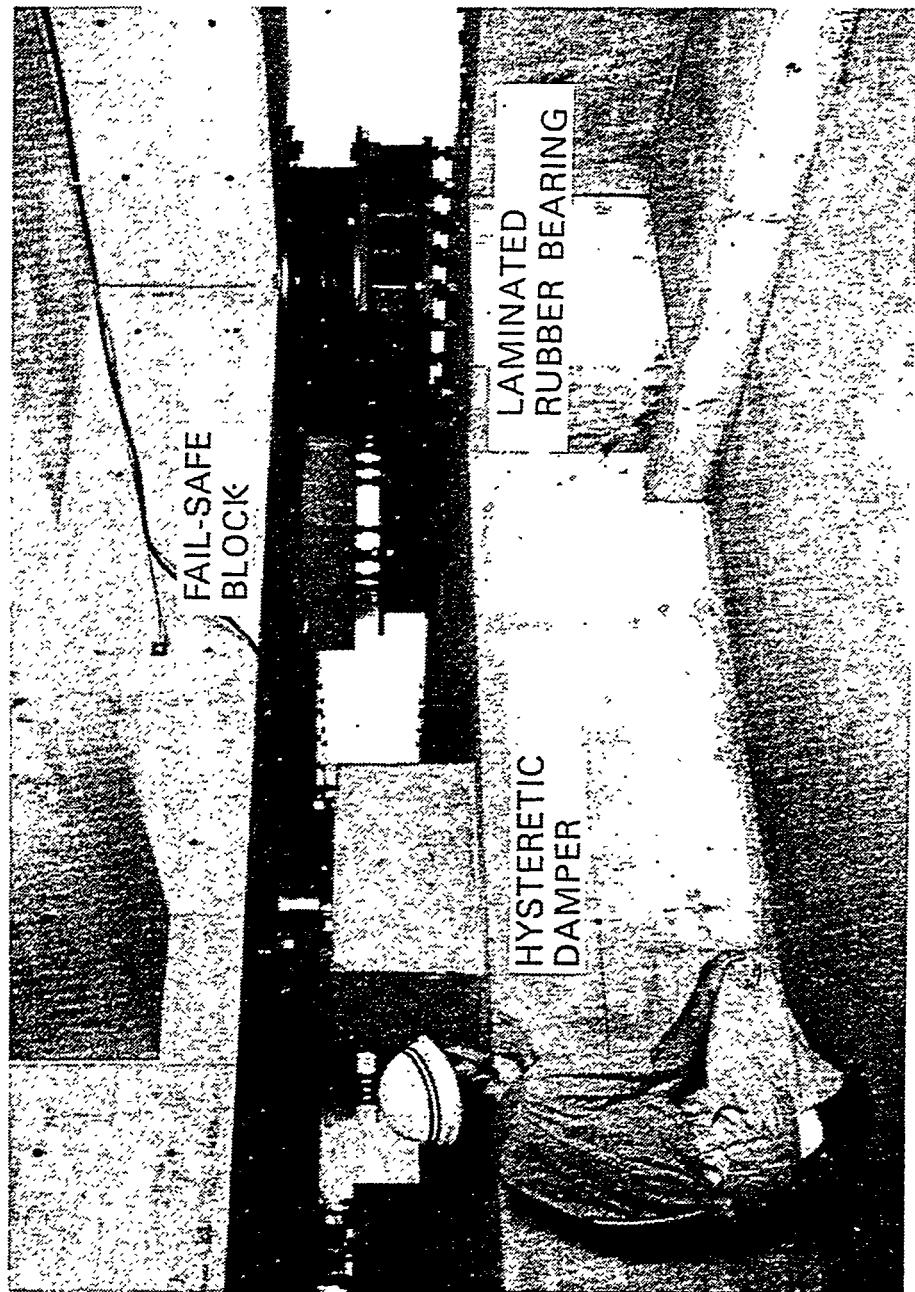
Isolators, Dampers, and Oil Buffers as Installed in the Kajima Building
